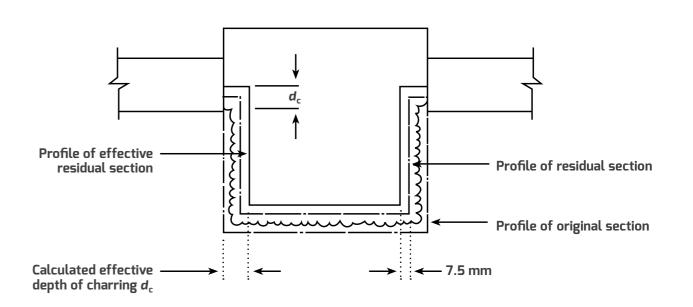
DETAILS OF CHARRING AT JUNCTION WITH FIRE PROOF BARRIER
